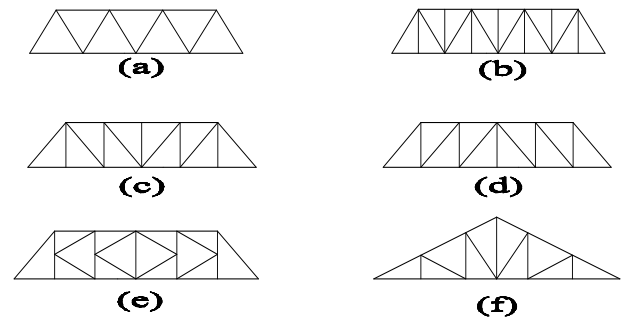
Different Types of Truss, a) Warren Truss b) Warren Truss with Verticals c) Pratt Truss d) Howe Truss e) K Truss f) Roof Truss.
